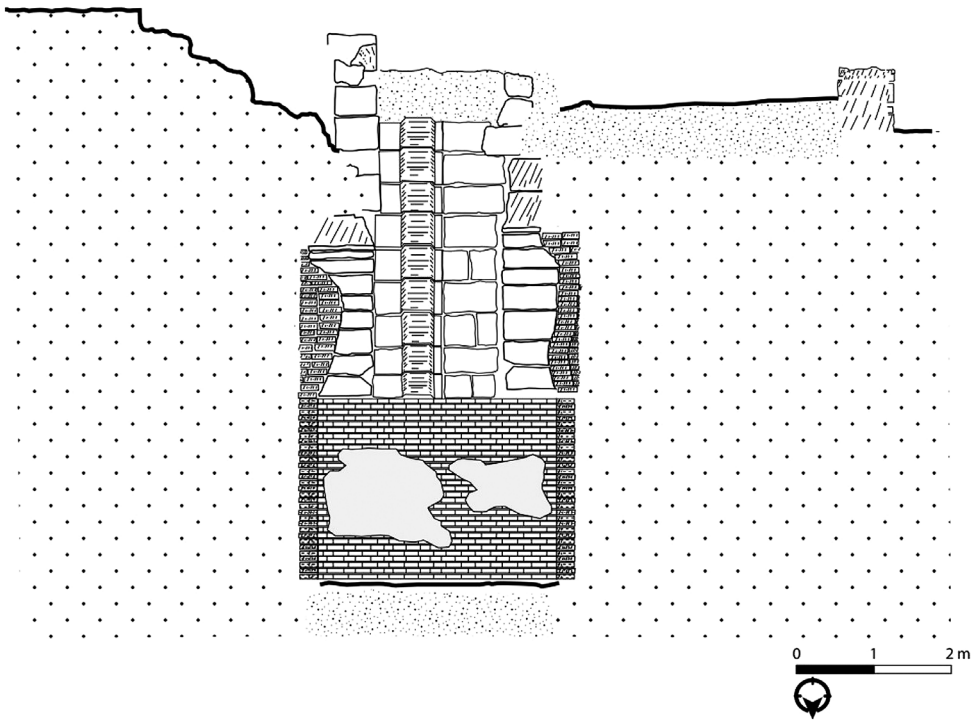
AA section of Saqiya structure no. 2 and the maksem.
